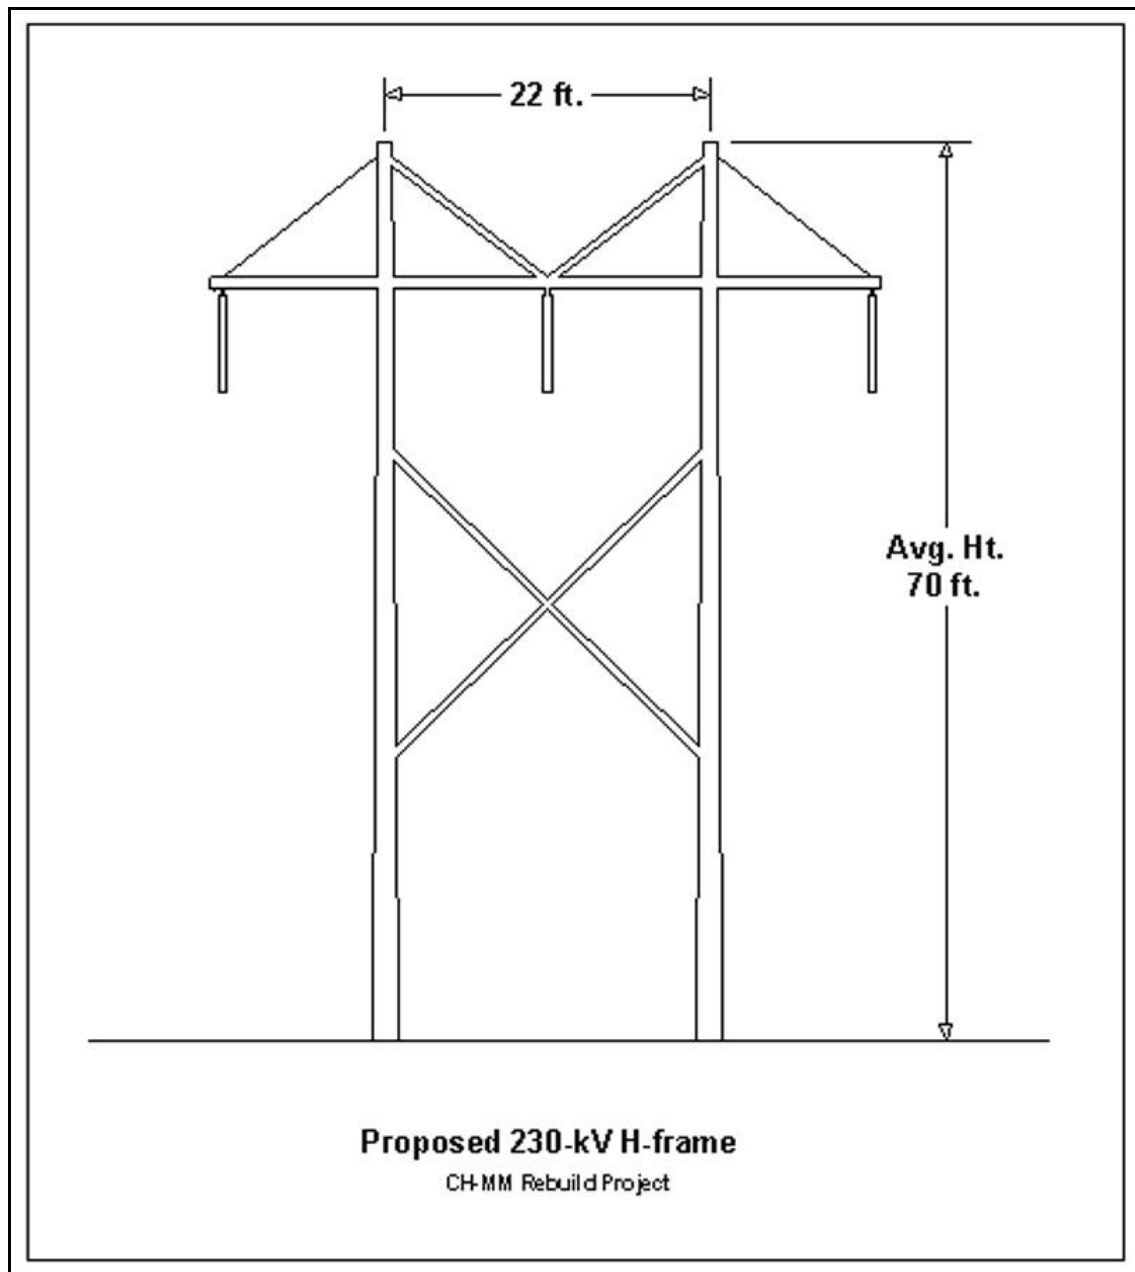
The 230-kV Wood H-Frame Structure
